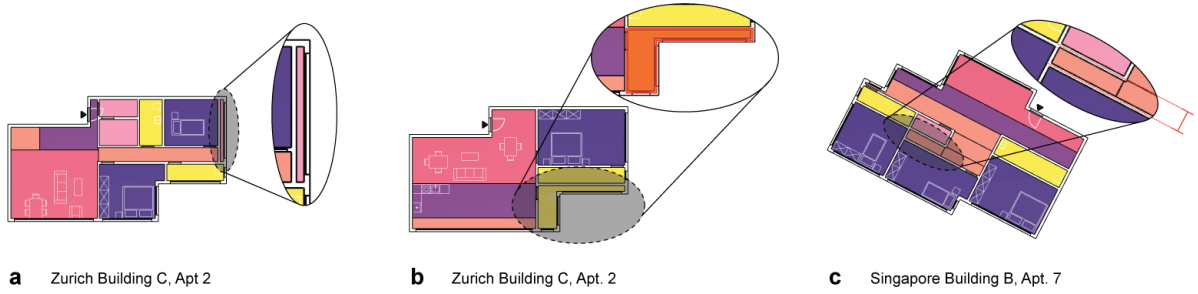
Different failure cases where the subdivision algorithm creates a geometrically valid but spatially infeasible floor plan: An infeasible room blocking a bedroom façade access (a), subdivision resulting in infeasible room geometry (b), and subdivision resulting in foyer spaces that are too thin to be passable (c).
